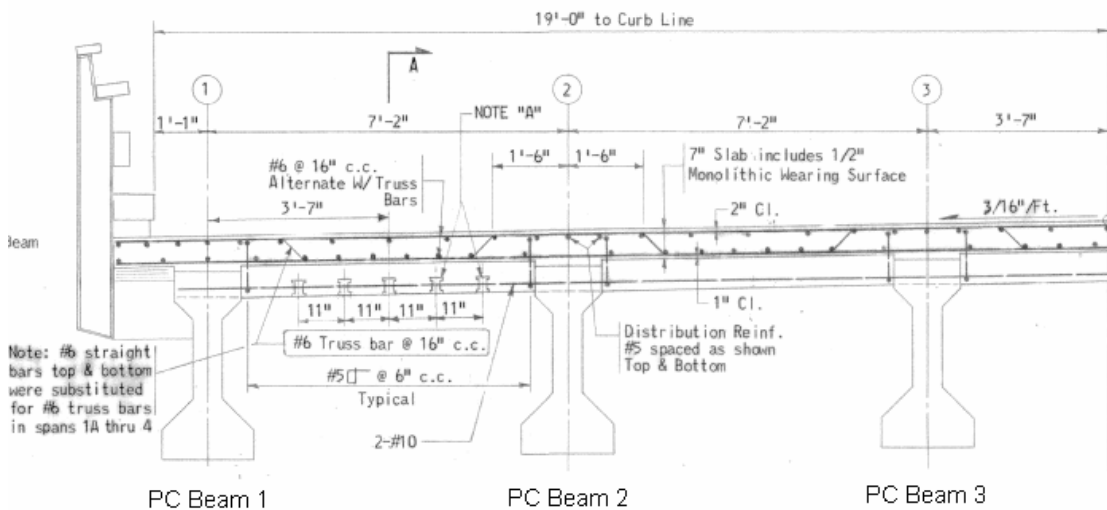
Prestressed Concrete Beam Typical Half Section
